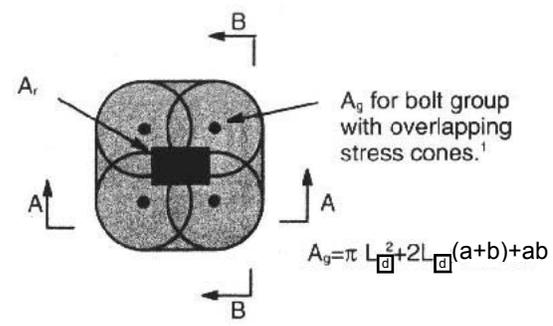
Stress Cone Development for Single Anchor Bolts in Concrete
